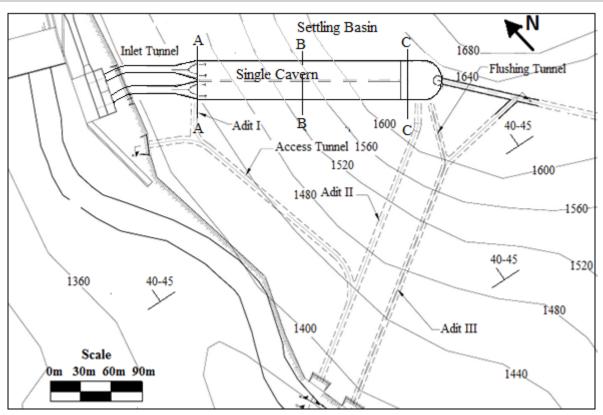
Proposed layout plan of settling basin cavern (Alternative II)
